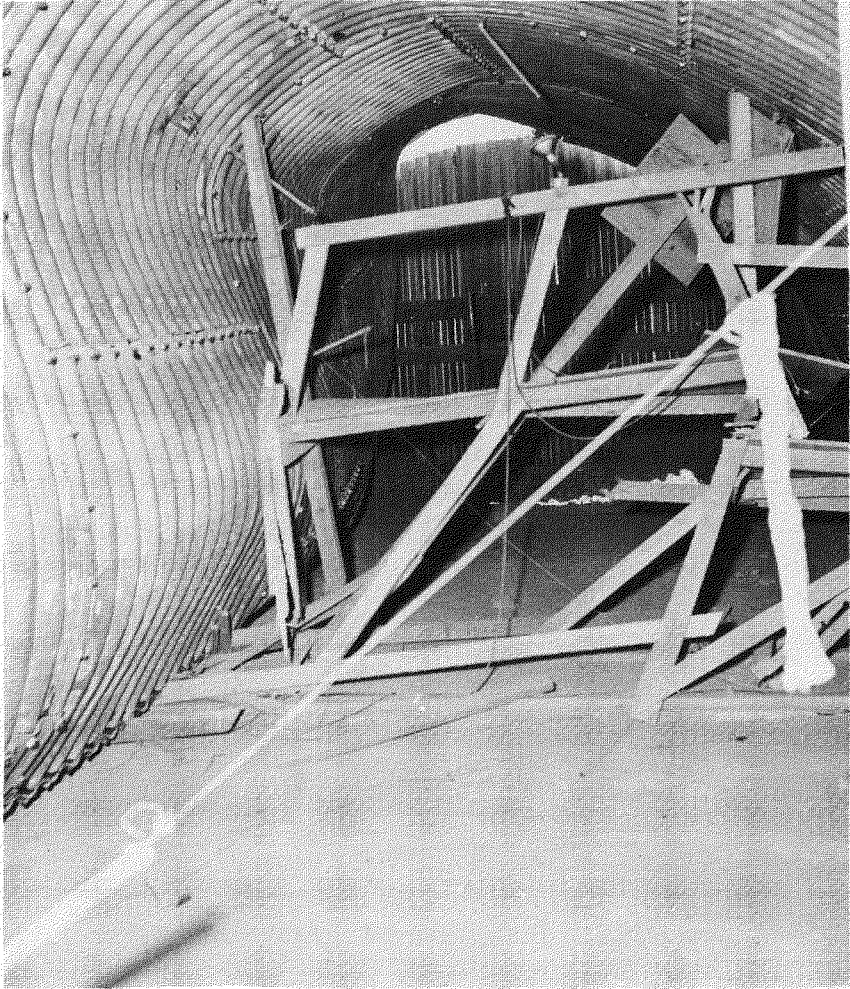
B-type damage to earth-covered 10-gage corrugated steel structure.
